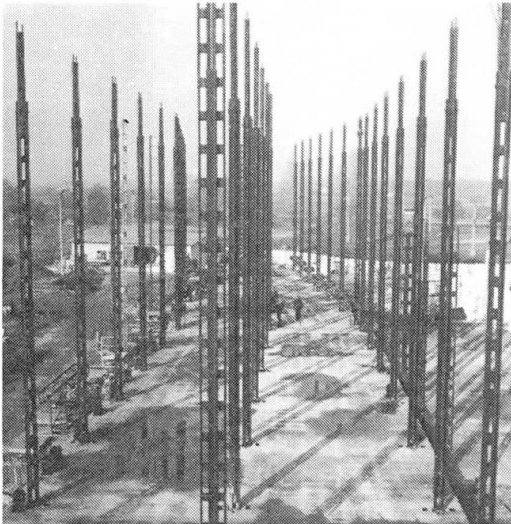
Lifting of two segments of a hospital building with column spacing 6.00x6.00 m, before lifting
